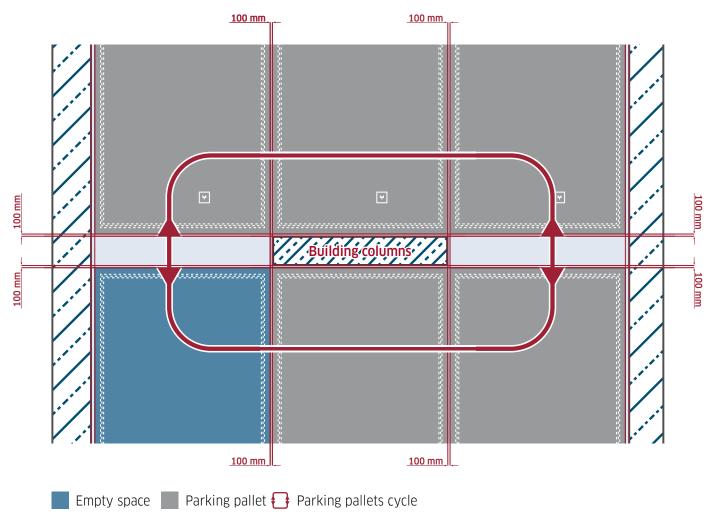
Parking system with five parking spaces (standard pallets) and integrated building support.
